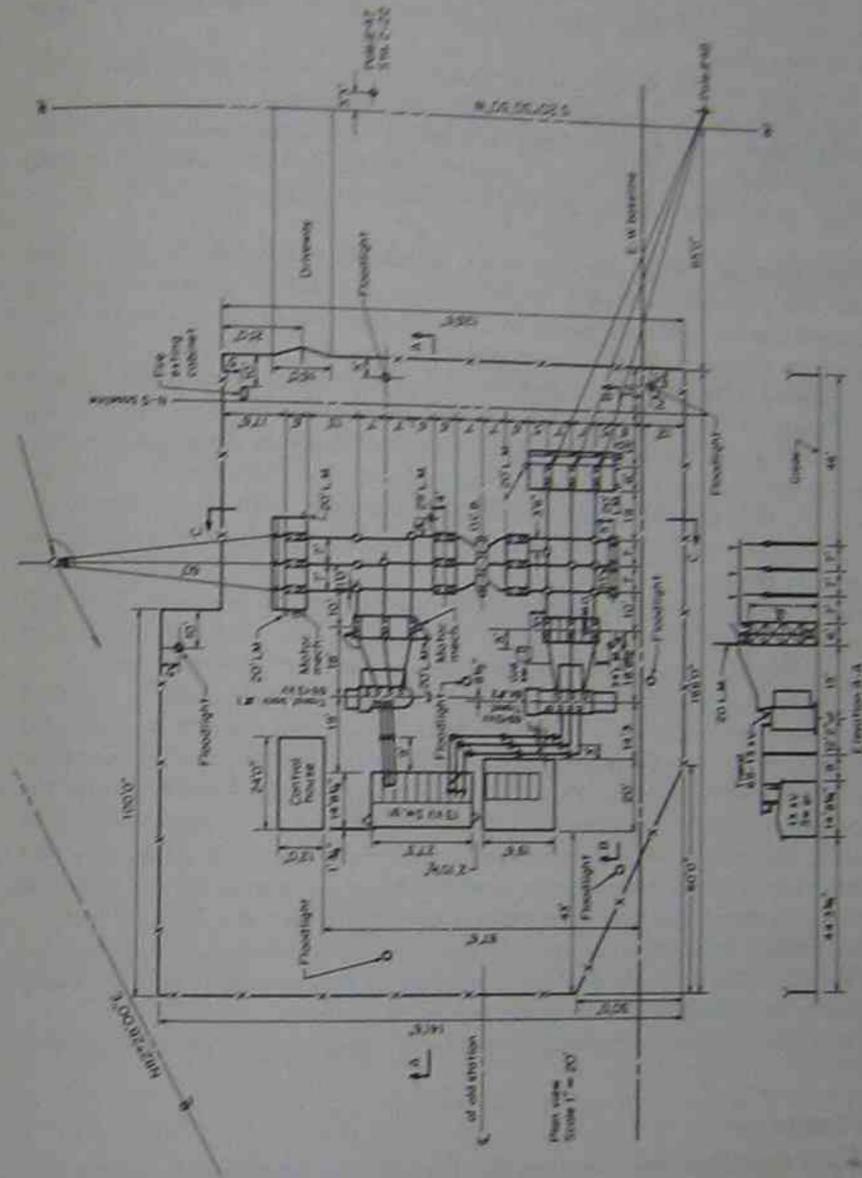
Typical substation arrangement. (Courtesy Long Island Lighting Co.)
